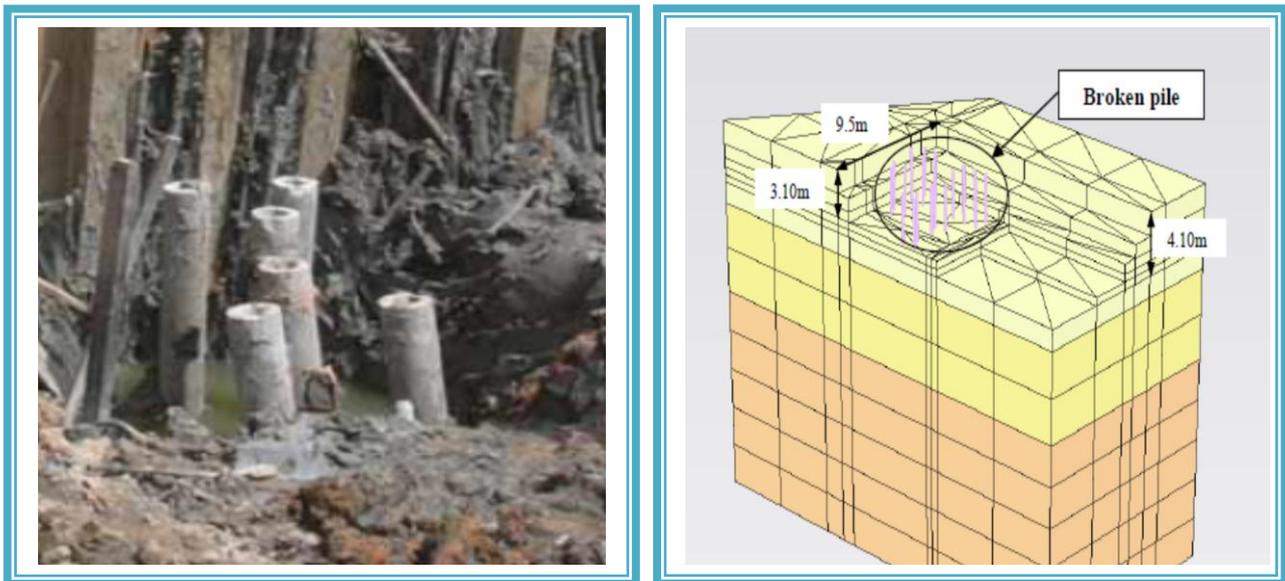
(a) Picture showing a 3-pile group of broken piles: (b) Excavation profile for final phase of staged construction ,Kok et al., 2009.
